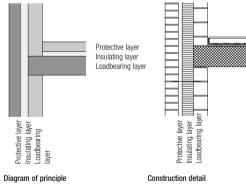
Case study: double-leaf masonry, wall-floor junction
